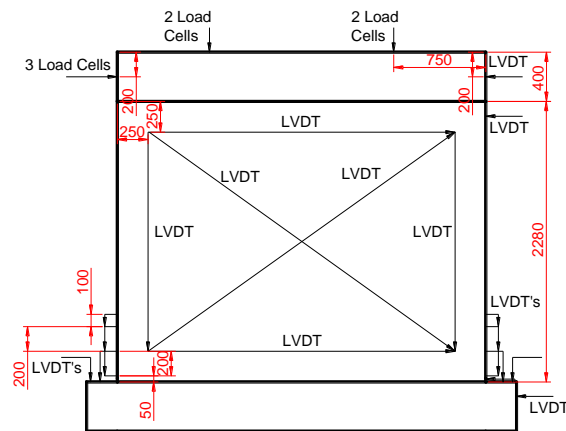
Instrumentation installed on both Specimen 1 and Specimen 2 (All dimensions are in mm.)
